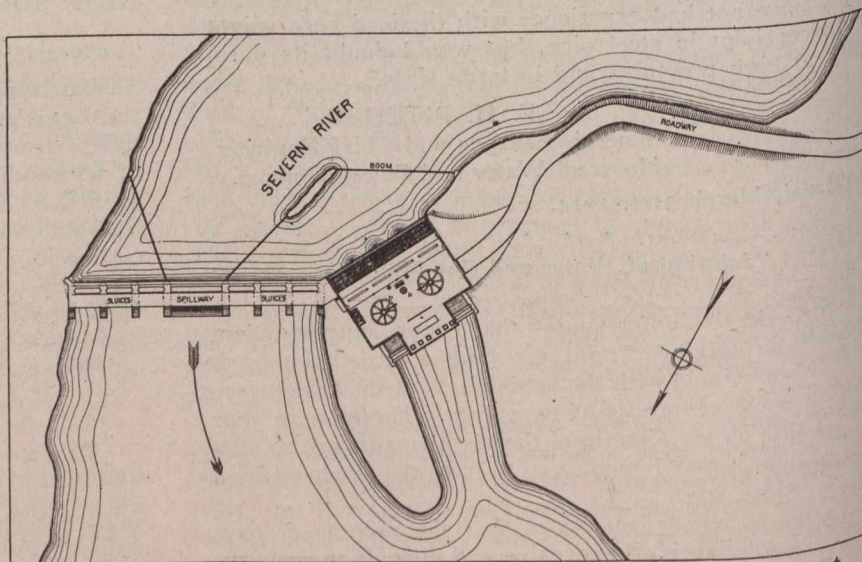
General Arrangement of Wasdell's Falls Power Plant.
